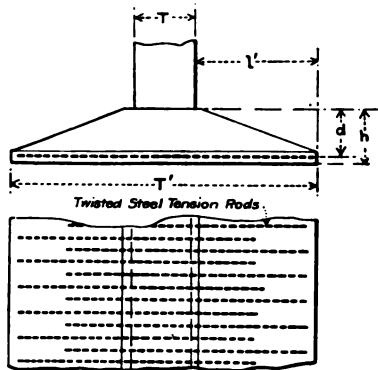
Typical Wall Footing by Mr. E. L. Ransome.
